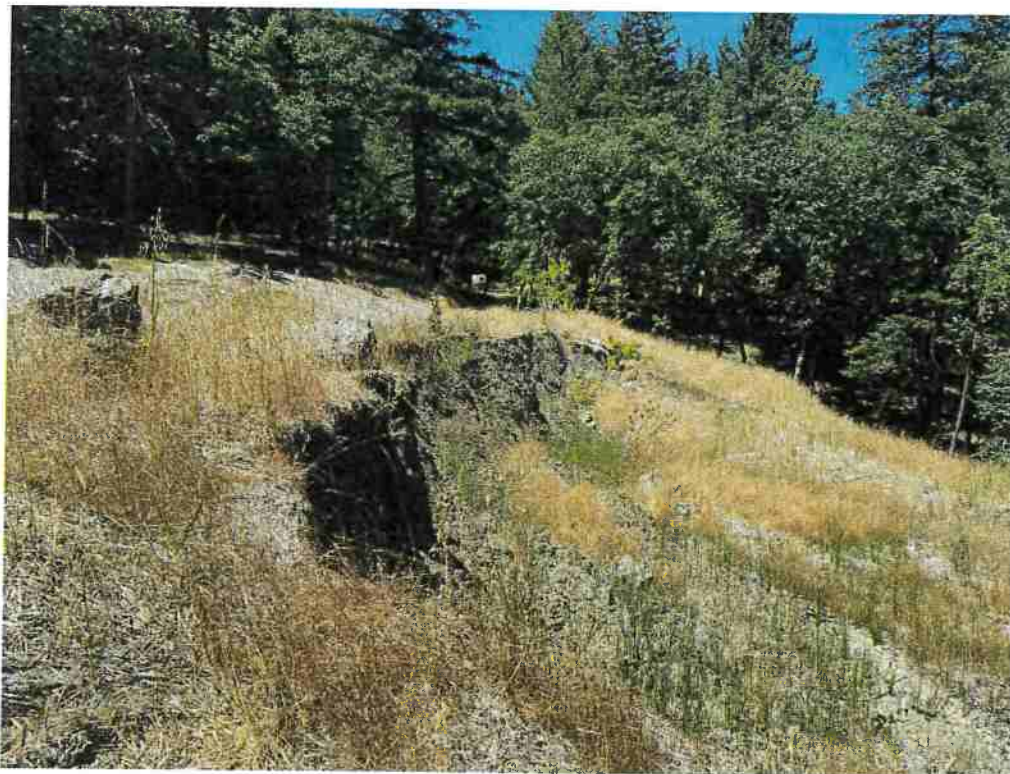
Observation Point 2(b) – Fillslope failure below graded flat.
